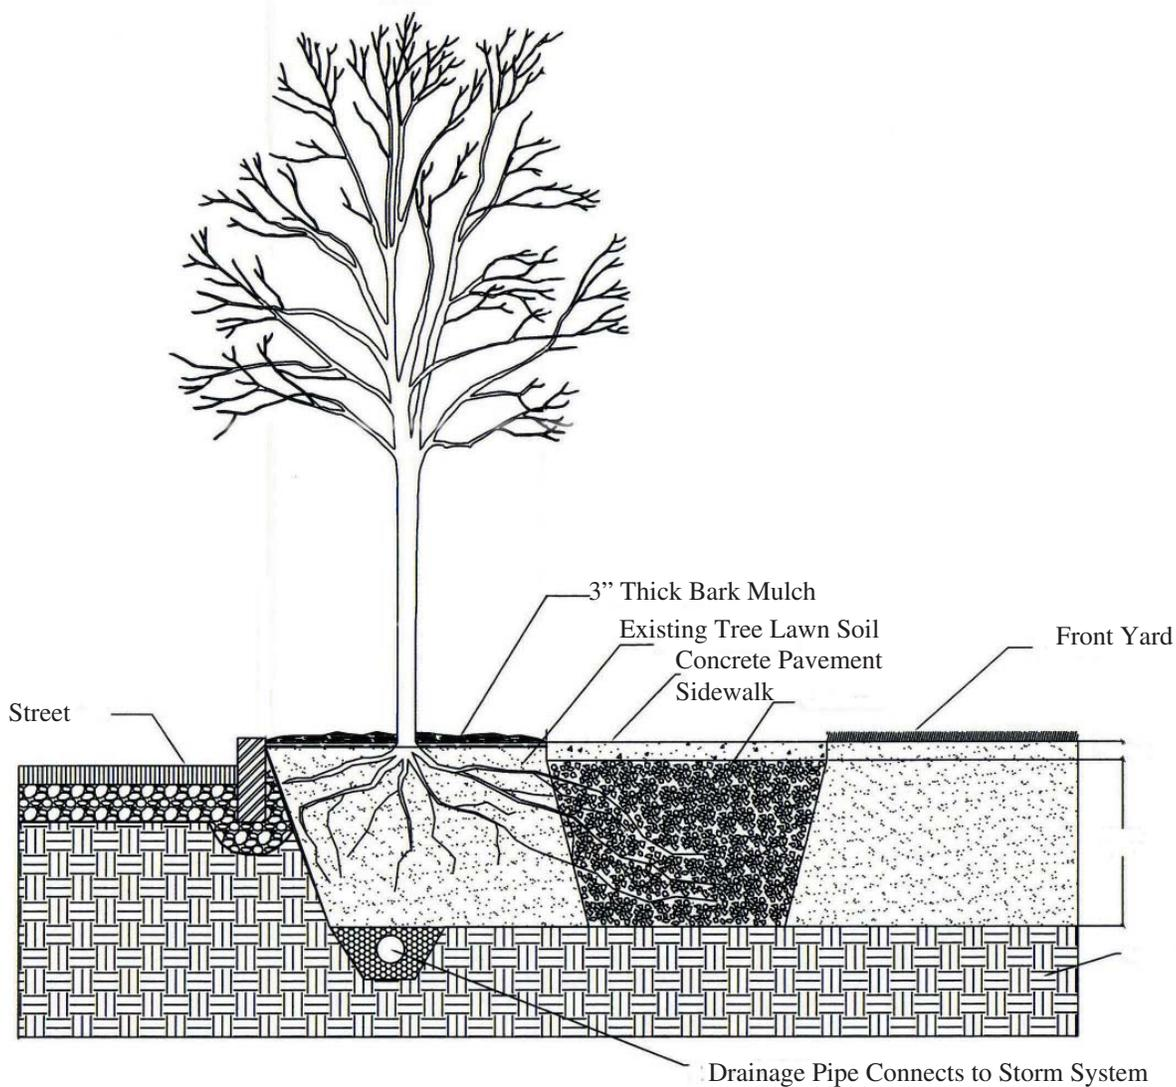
CU-Structural Soil™ break-out zone from narrow tree lawn to adjacent landscape area
